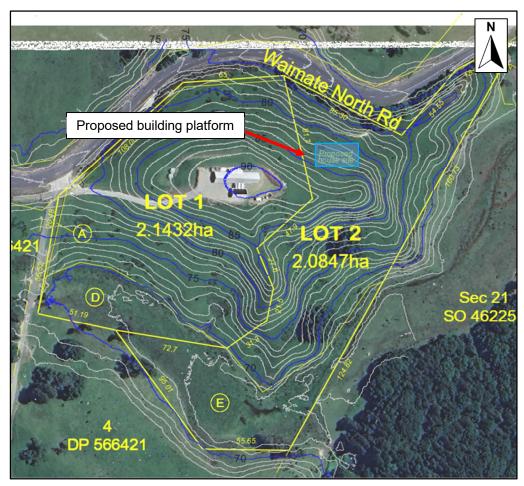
Proposed subdivision plan (Williams and King Ltd).
